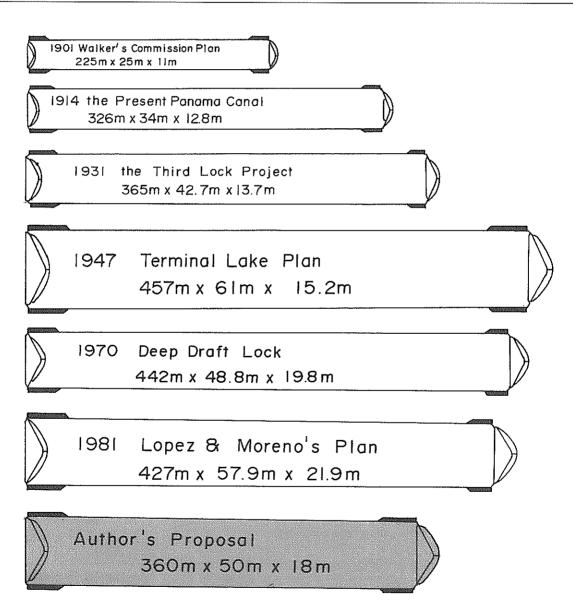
Trend of Lock Size of New Panama Canal Plans and Author's Proposal
